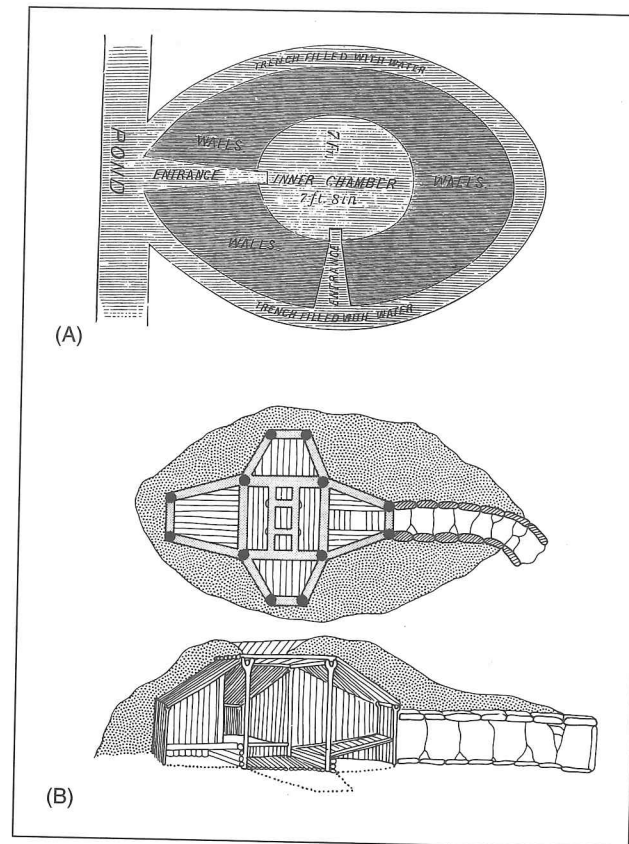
Human and animal architecture. (A) Ground plan of beaver lodge (from Morgan 1868: 142); (B) Floor plan and cross-section of Eskimo house, Mackenzie region (from Mauss and Beuchat 1979: 4).
